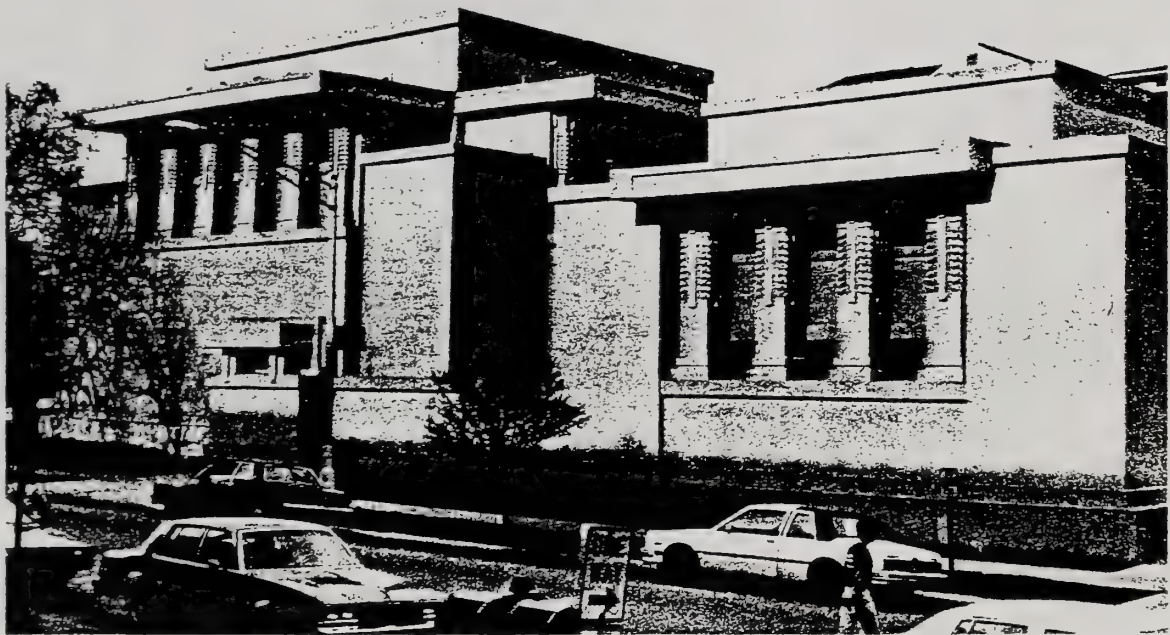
Once the repair work was complete, the entire building was sprayed with a concrete mixture consisting of pea-gravel, cement, and sand, which was then hand-
